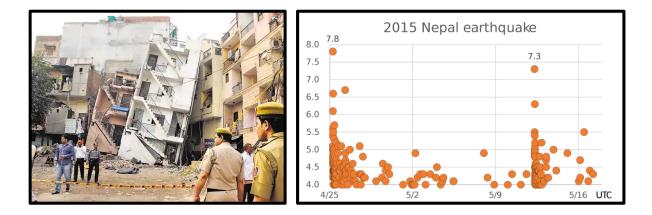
Damaged building in Delhi, India due to aftershocks of Gorkha earthquake, Nepal Source: <u>https://www.hindustantimes.com/delhi/quake-hit-building-collapses-triggers-scare-in-south-delhi/story-lvCDJWwLsLheQDWFI3ZdyO.html</u>
